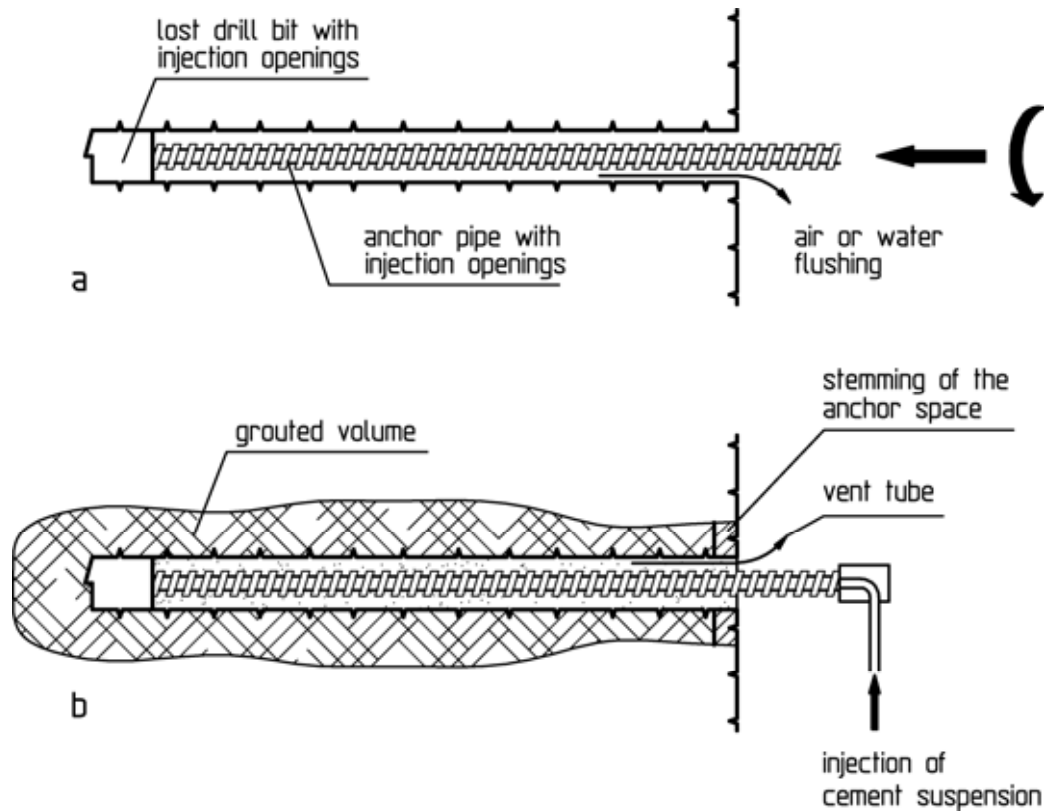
Installation of an injection drill bolt: a) Drilling; b) grouting
